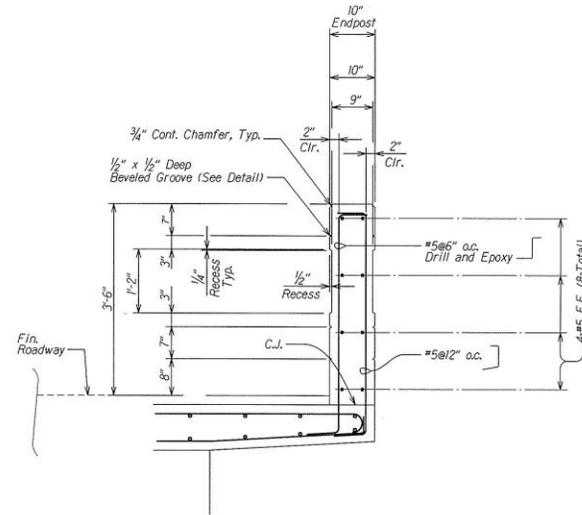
HDOT AGT to 42-in. Tall Bridge Rail Details, Continued
